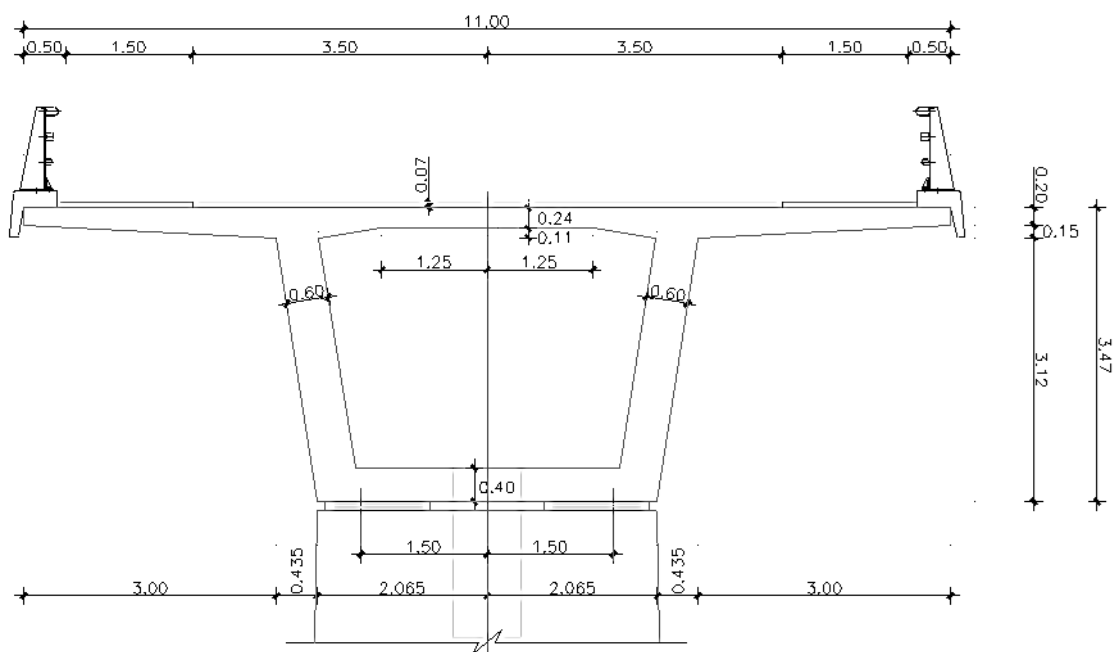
Río Gabriel Bridge - Cross-section at above the piers
